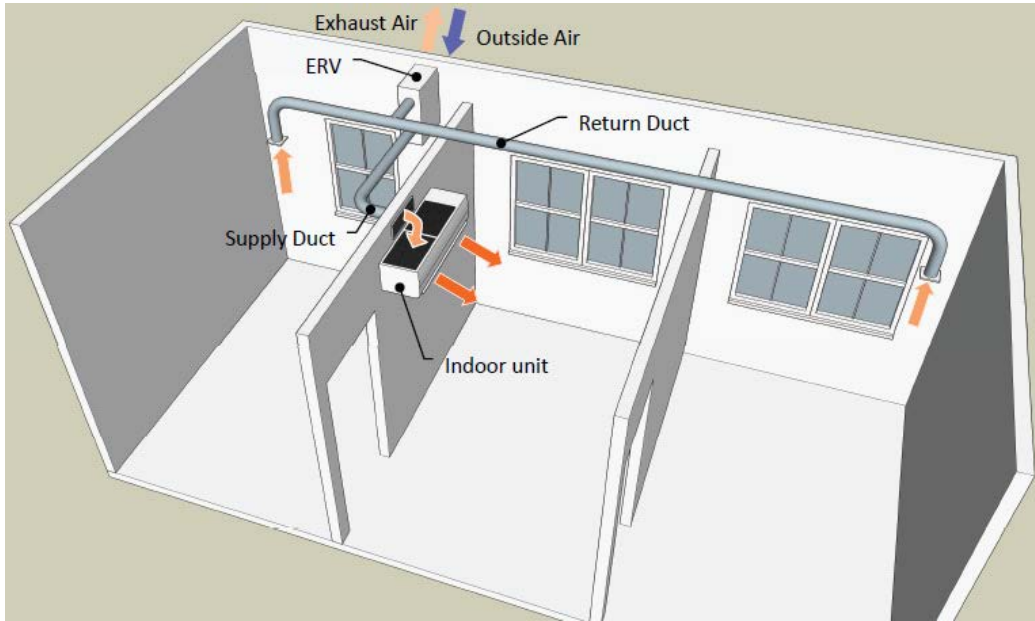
Potential configuration of balanced whole-house ventilation system to provide some internal circulation with a point-source heating system
